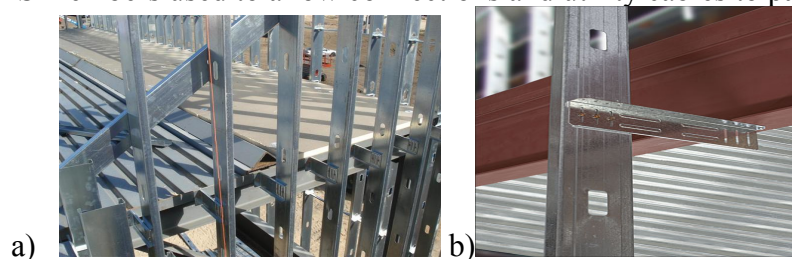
Cold-formed steel perforations in a) cold-formed metal framing b) deflection clip
